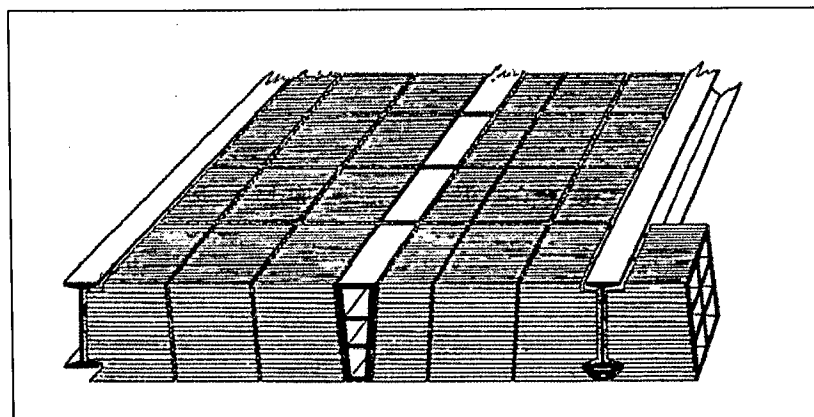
(b): Flat Clay Tile Arched Floor Systems – Type II
